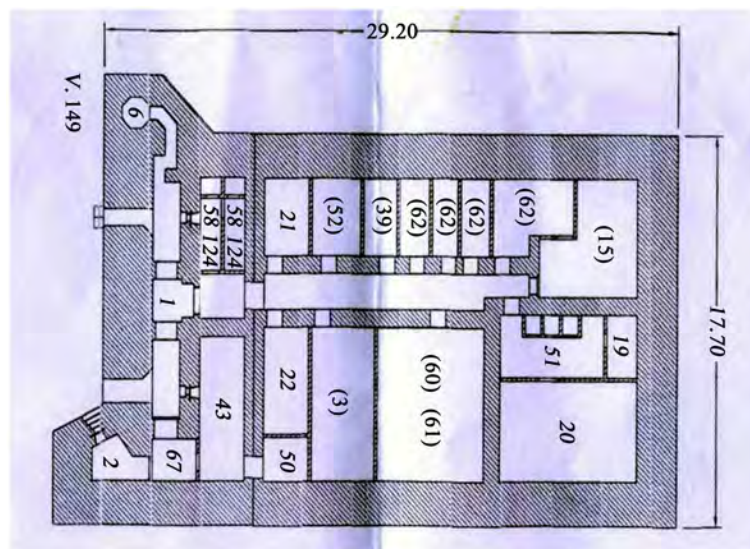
V149 plan-1 gas lock; 2 close combat room; 6 observation post; 19 wireless officer room; 20 wireless room; 21 heating room; 22 ventilation room; 43 engine room; 50 fuel room; 51 telephone exchange room; 58, 124 latrines/washrooms; 67 gear room (plan: P. Heijkoop); possible identification of the other rooms: (3) crew room; (15) charger room; (39) officers room; (52) telegraph room; (60) Naval Lieutenant room; (61) radio reconnaissance room; (62) work room (Rudi, 1988).
